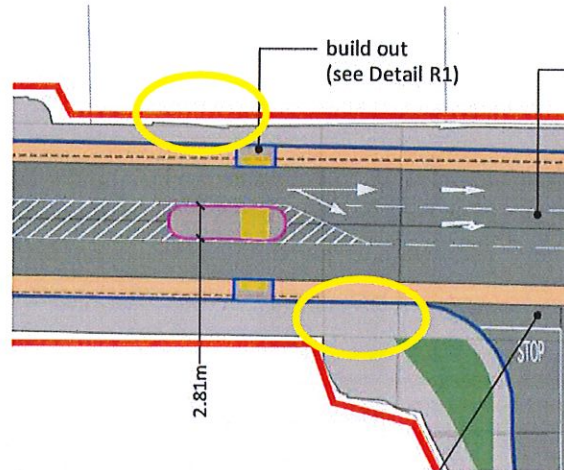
DR-P8-02 Rev PL1, Central island, Battery Road.
